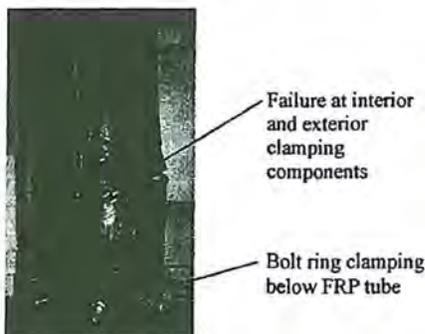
Failure of the 8-bolt base fixture.
